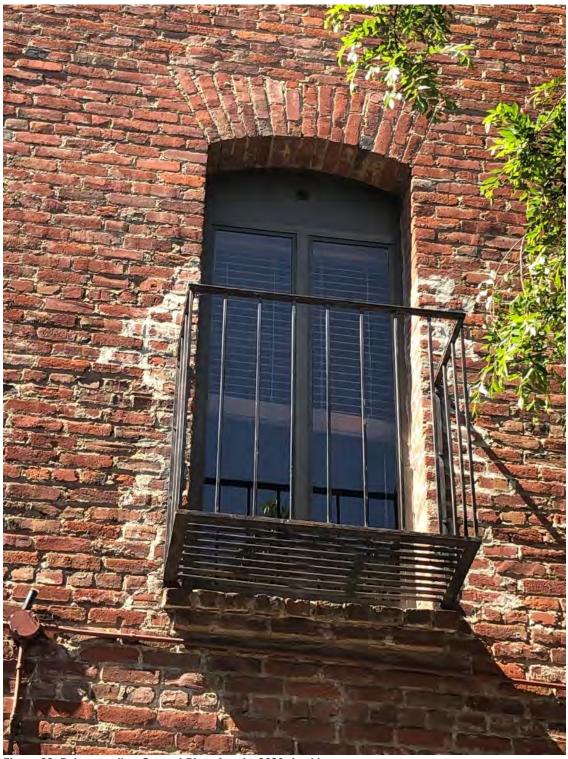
Balcony rail at Osgood Place façade, 2020. Looking west.
